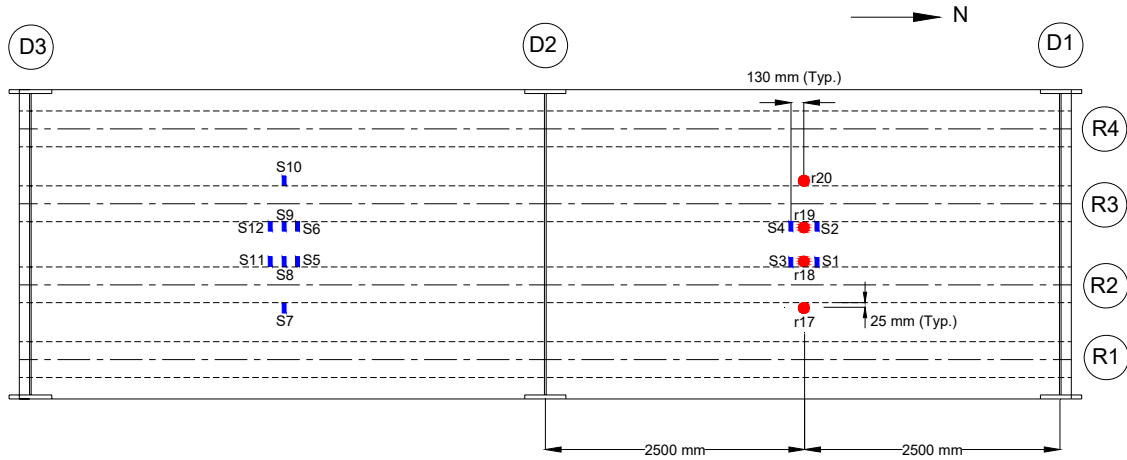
Specimen 3: Uni-axial Strain Gages in Bottom of Deck Plate near Rib-to-Deck Welds
